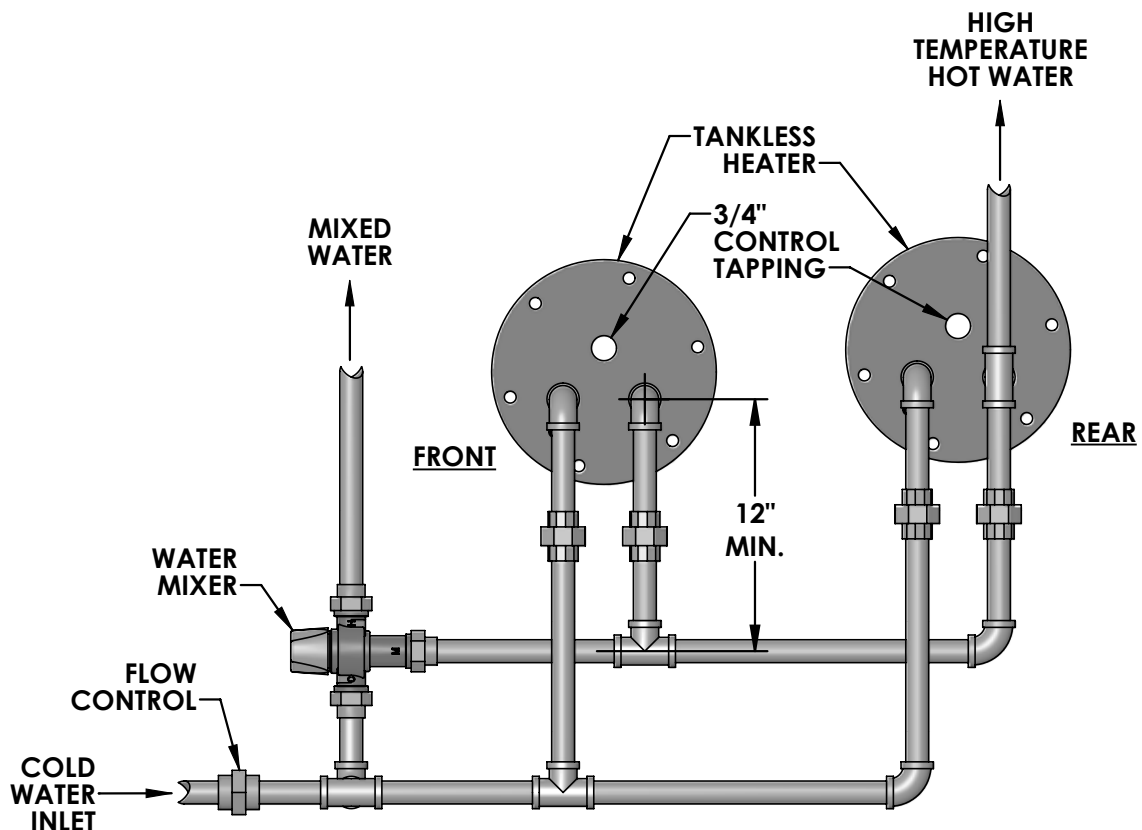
Suggested Piping – Dual Tankless Coil Installation
